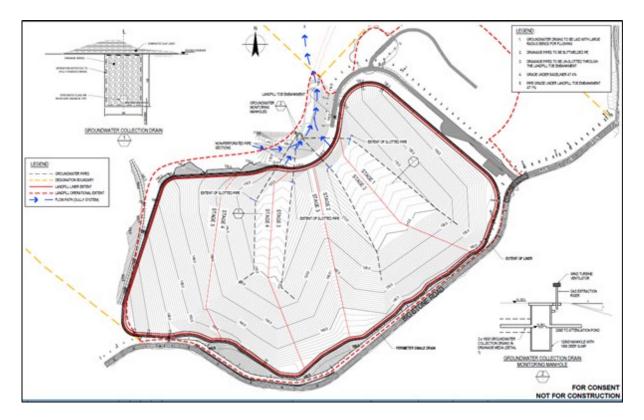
Groundwater Drainage Plan for proposed landfill. (August 2020)
